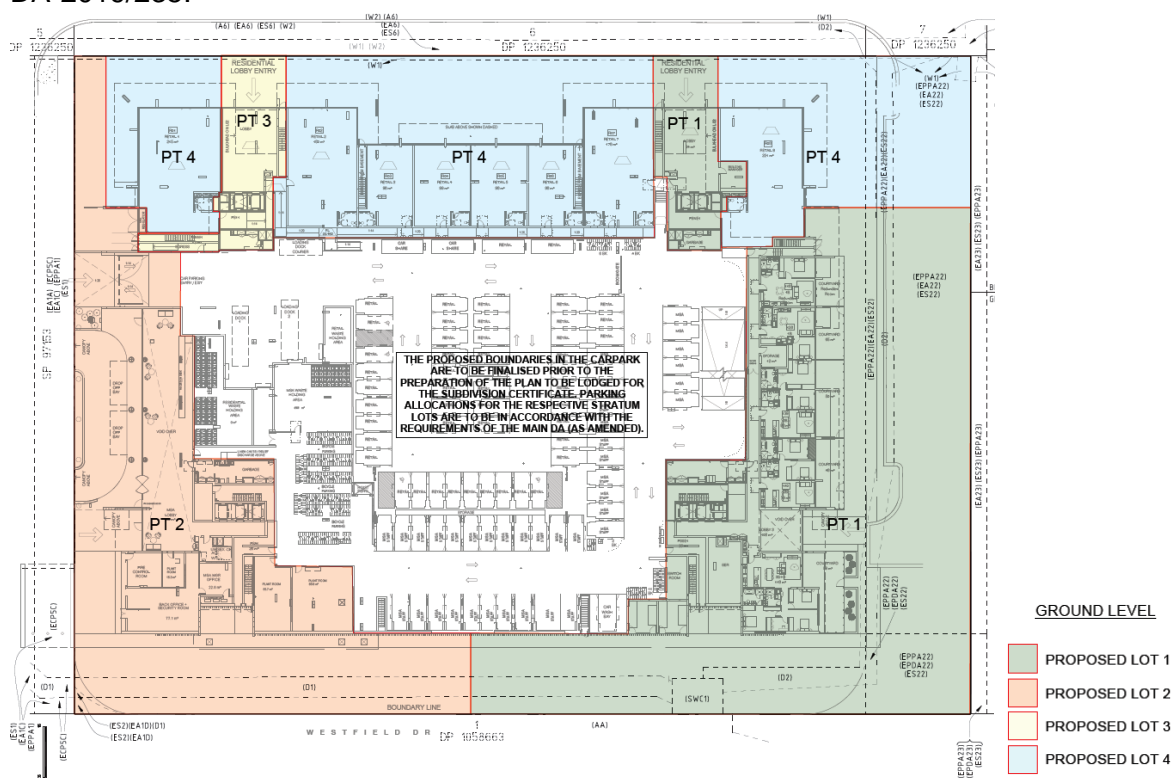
Indicative layout (ground level) of proposed stratum subdivision
